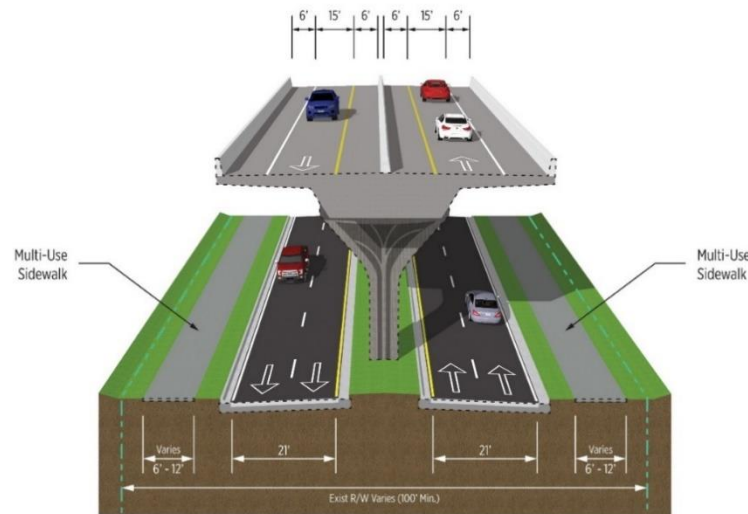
Existing Roadway Typical Section (Curb and Gutter) – Segment 3 – east end of Gandy bridges to West Shore Blvd.
